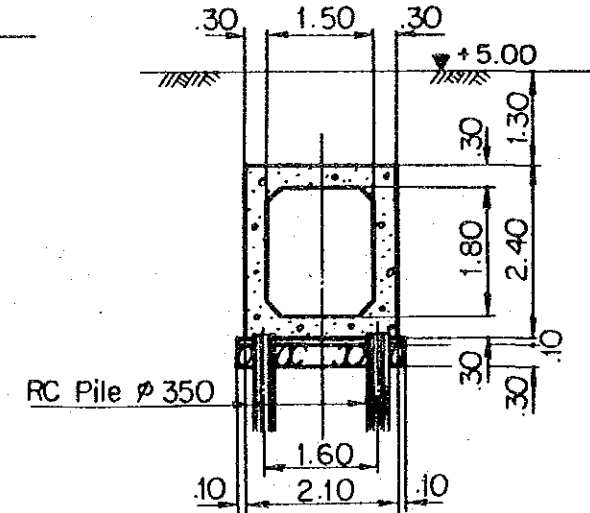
(9) Coal Storage Yard and Coal Handling Facilities
